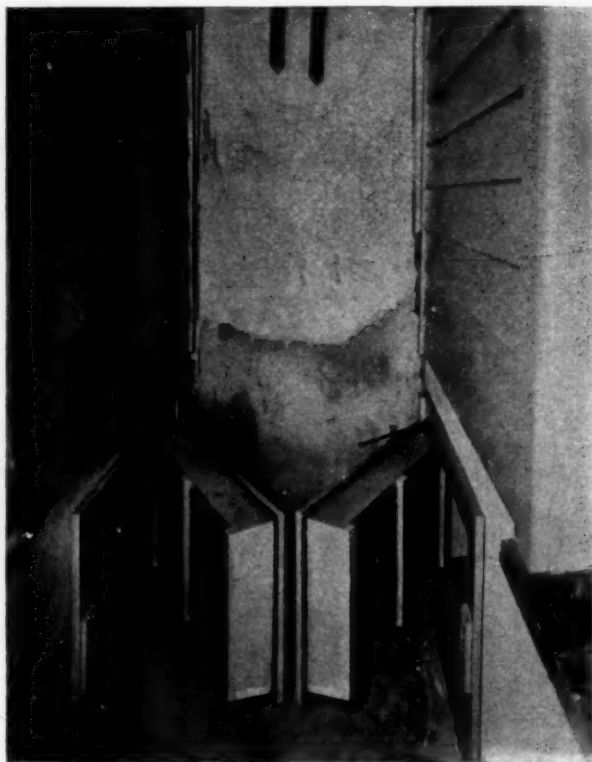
REFRIGERATOR DOORS OPENING INTO BASEMENT UNDER BOTH TEST ROOMS
